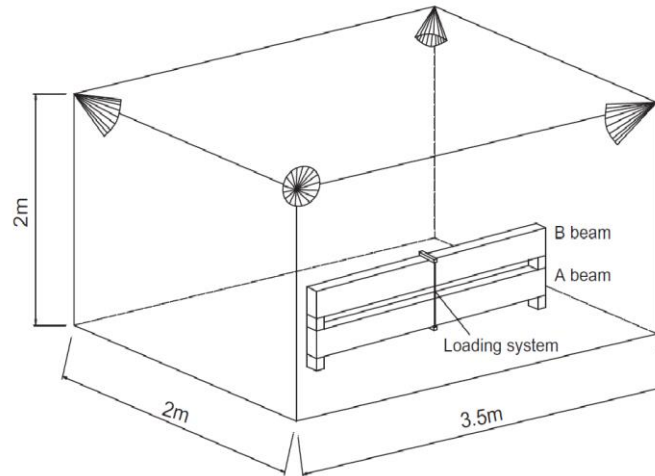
Loading system and conditional exposure of beams in the saline room [19]
